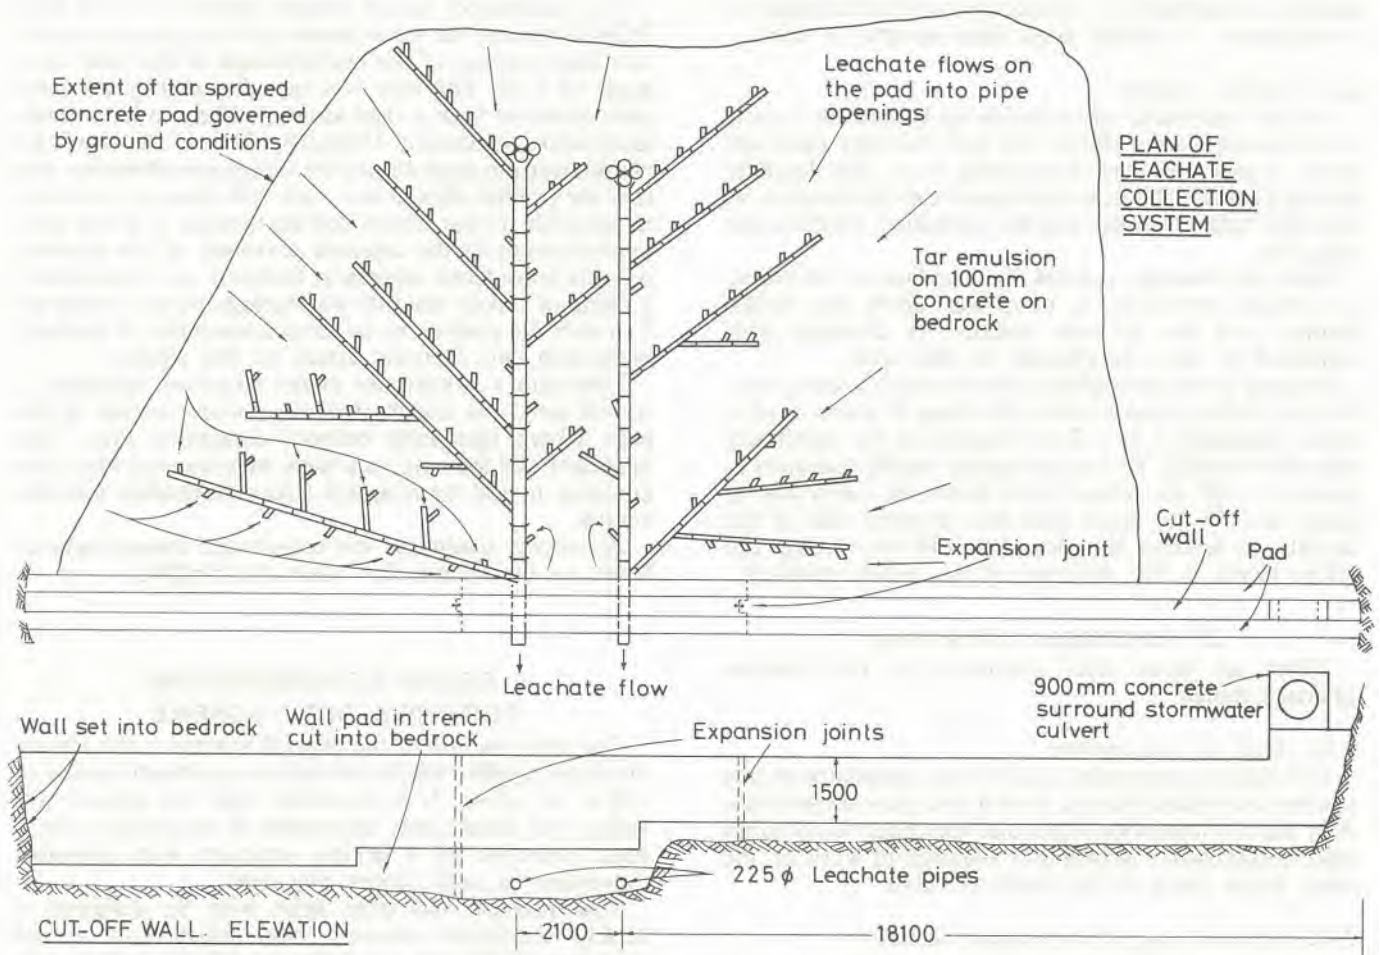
Elevation of cut-off wall and plan of leachate collection system.
